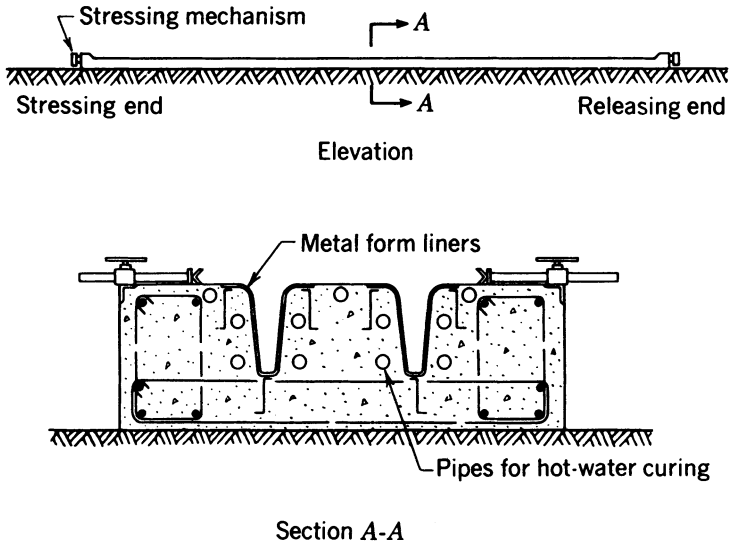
Column-type pretensioning bench for producing double-tee beams.
